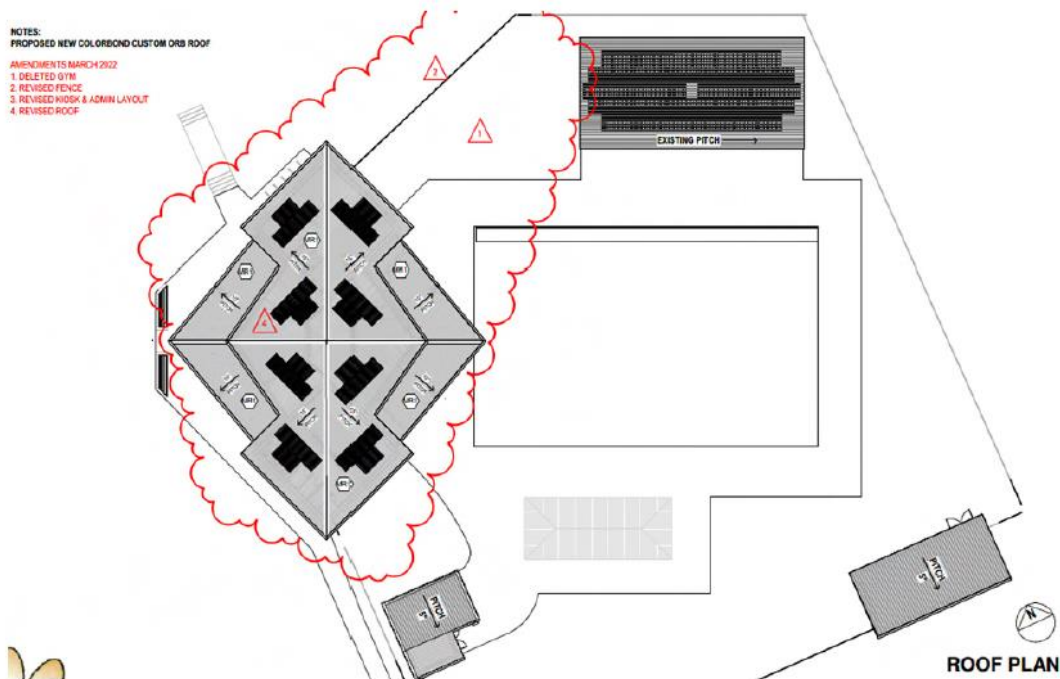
Proposed Roof Plan (Prepared by Paul Barnett Design Group)
